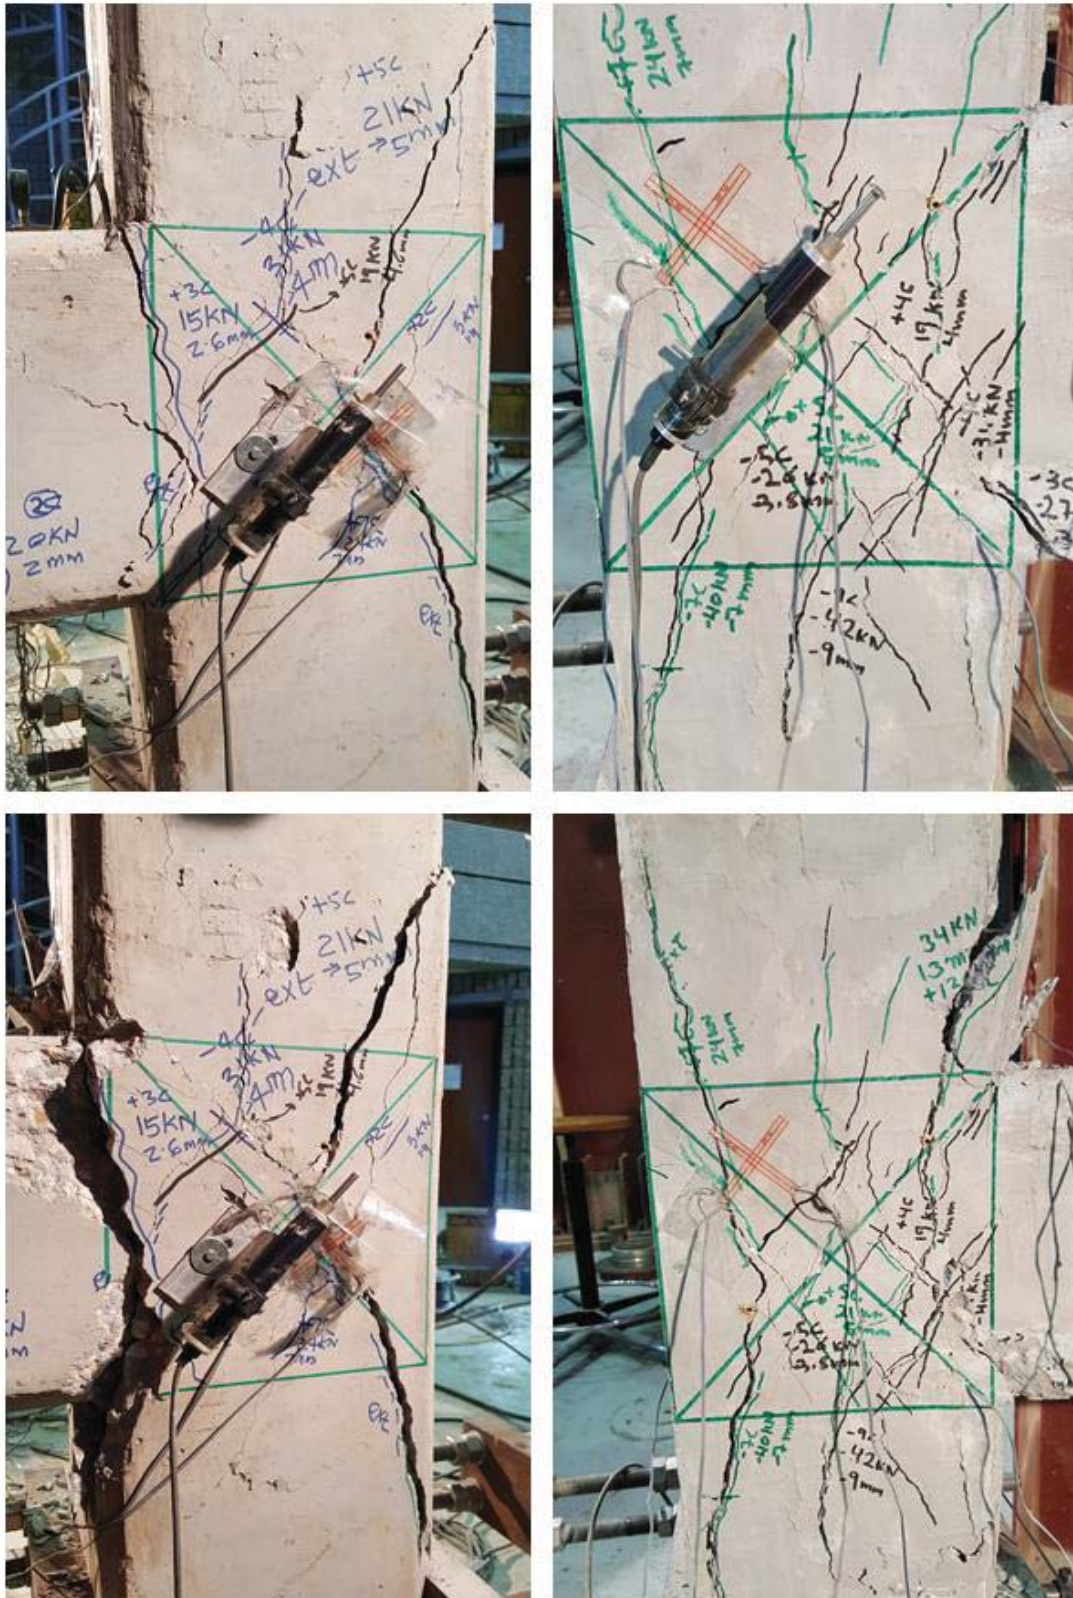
Crack pattern at intermediate and final loading stage of specimen SP-4
